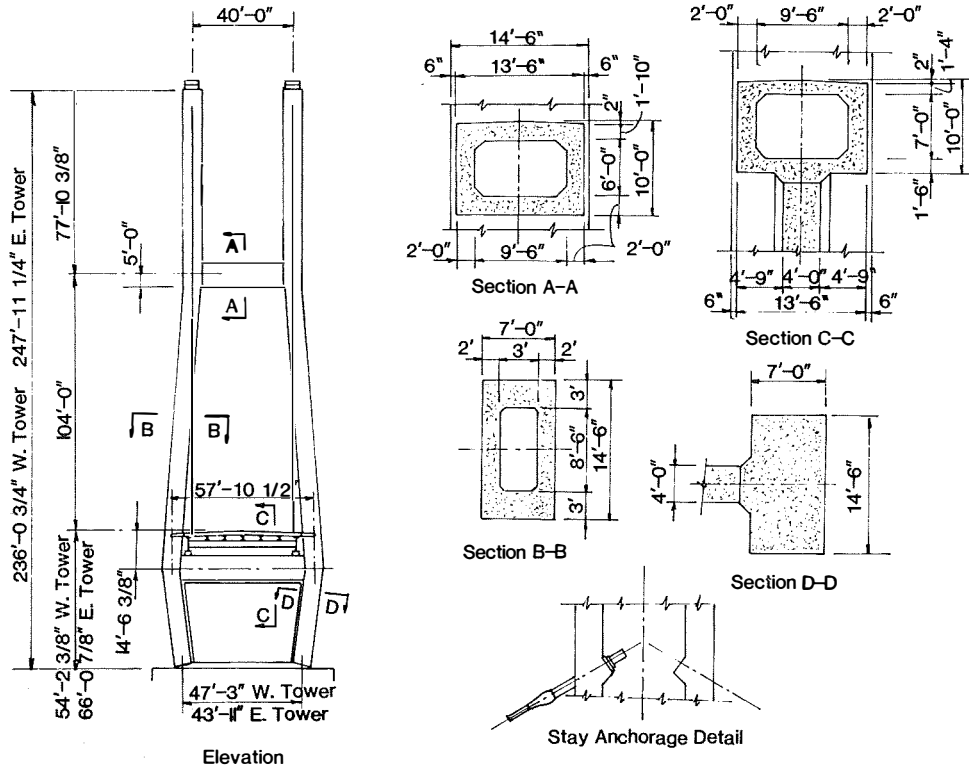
Quincy Bridge, pylon elevation and sections.
